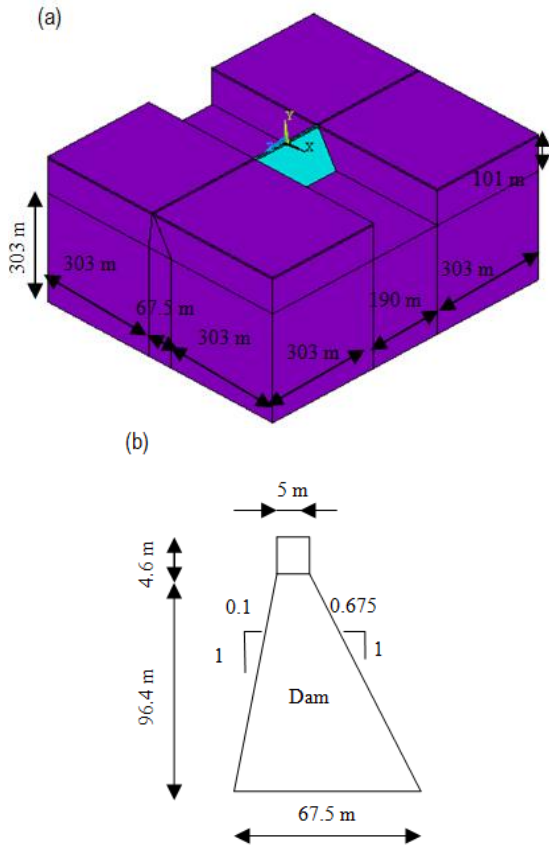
Geometry of Oued Fodda dam-foundation rock system: (a) dam-foundation rock system; and (b) dam body
